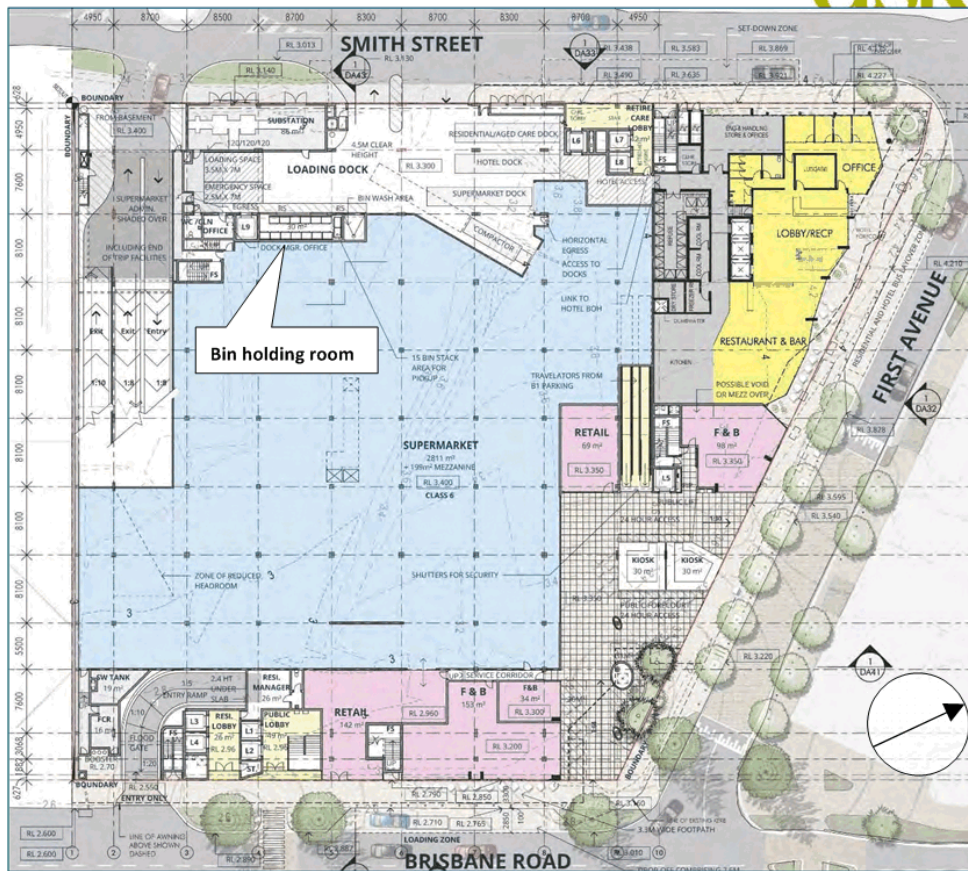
Ground Floor Plan of Development (Drawing 10630 DA11 Issue 8)
